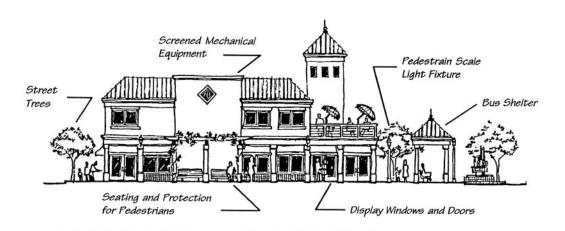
D.1 Large Scale Development Conceptual Elevation
